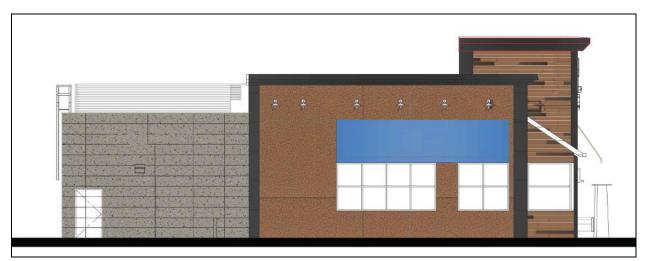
Proposed Site Plan Amendment- conceptual rendering East Elevation
